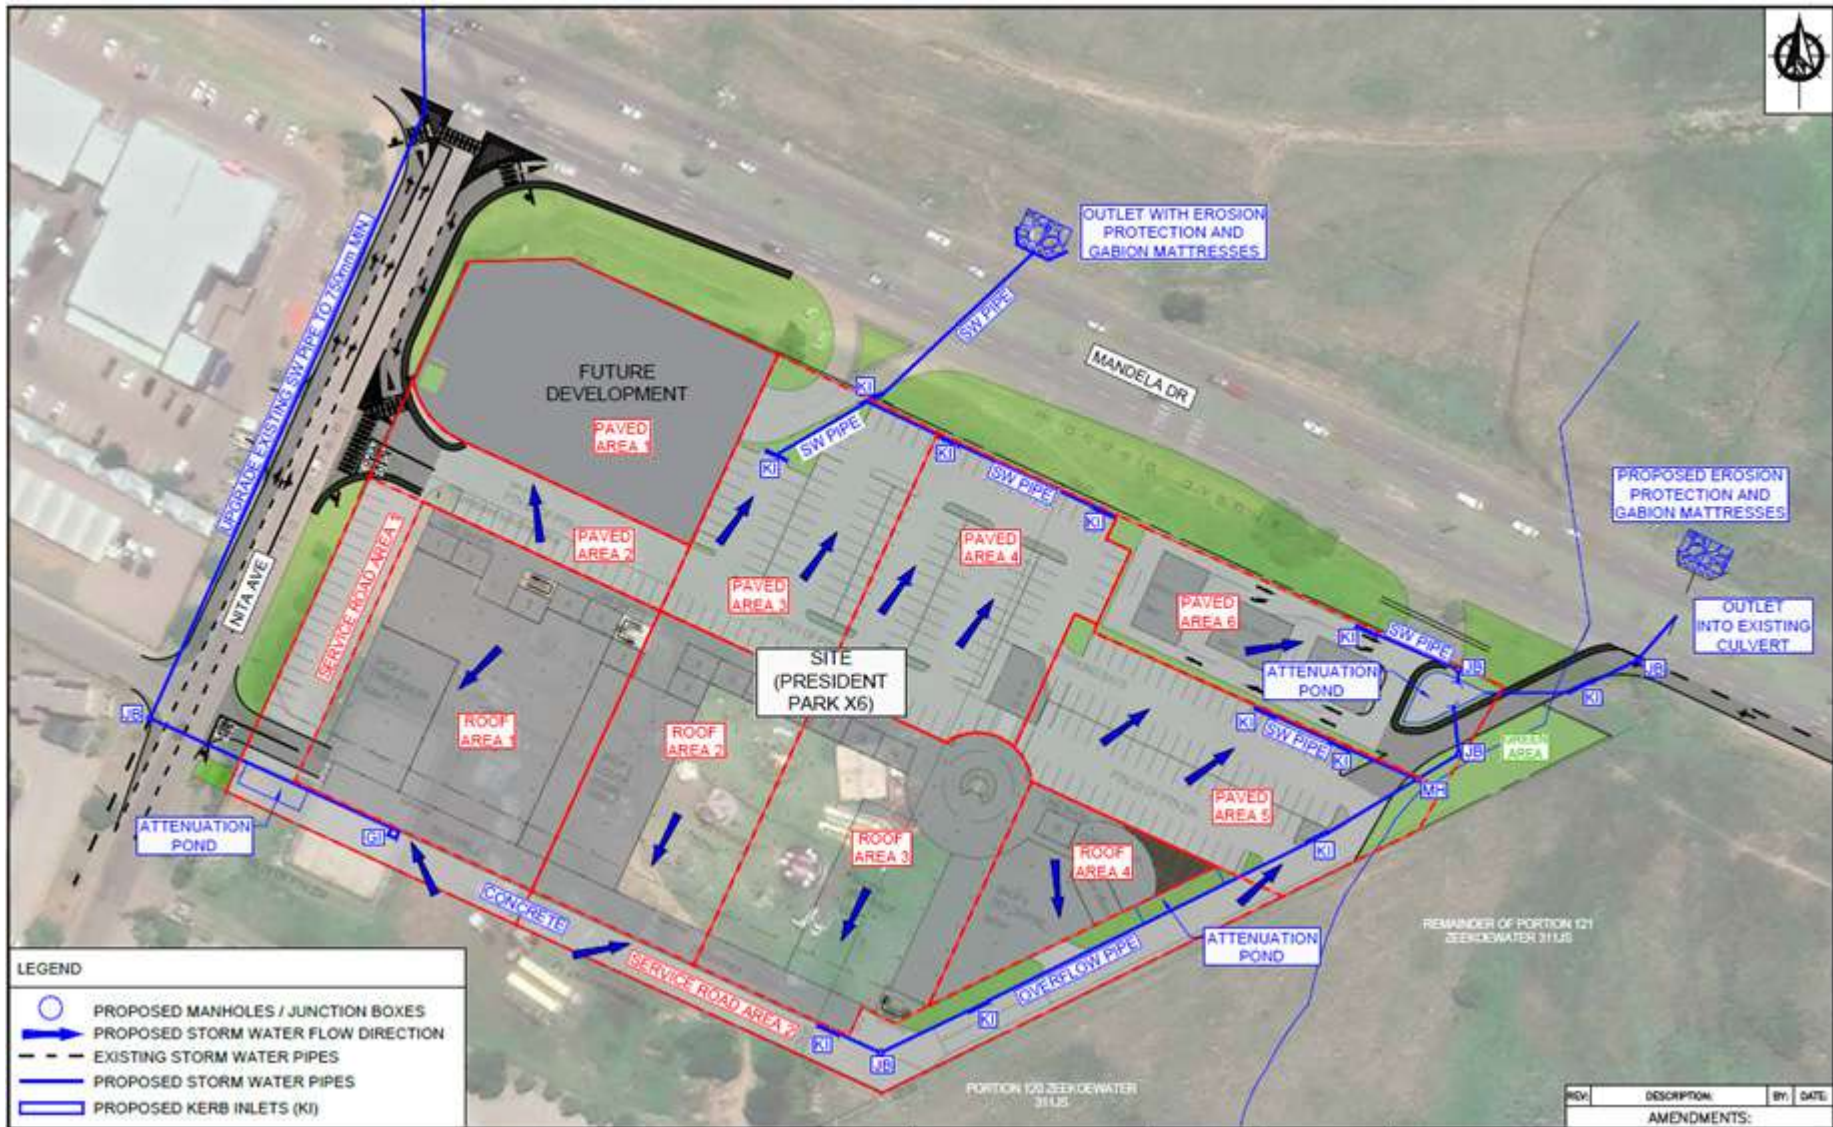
Proposed layout (Alternative 4) with storm water measures (Alternative 2) to be implemented (taken from Van Rooyen, 2021)
